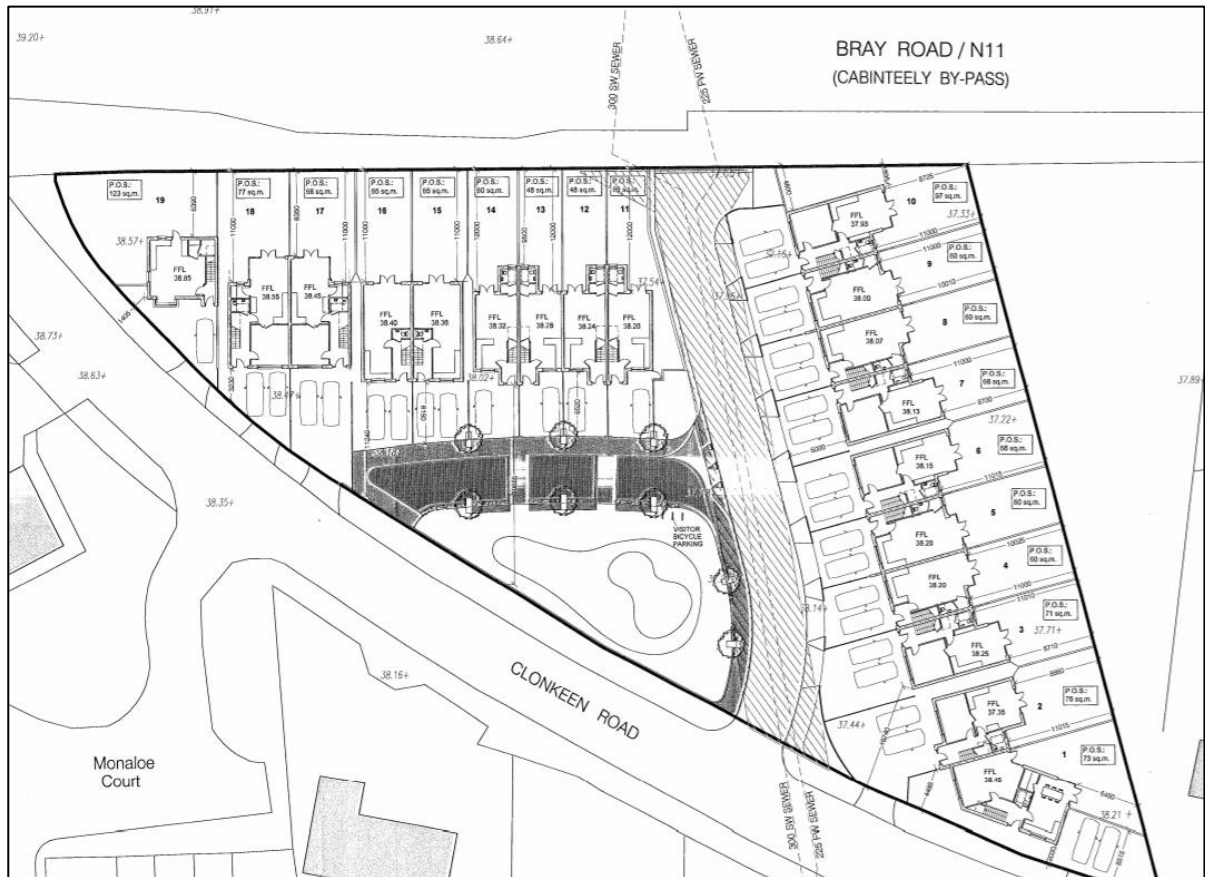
Proposed Site Layout Plan – Killart © Dun Laoghaire-Rathdown County Council 2020
